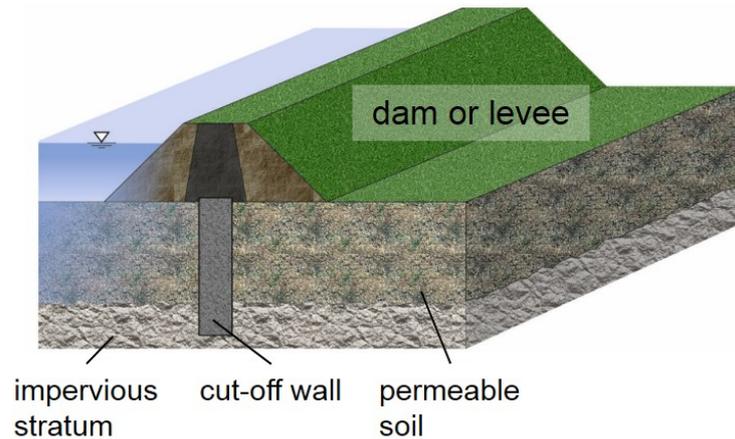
Schematic of an Earth Dam with Cut-Off Wall
